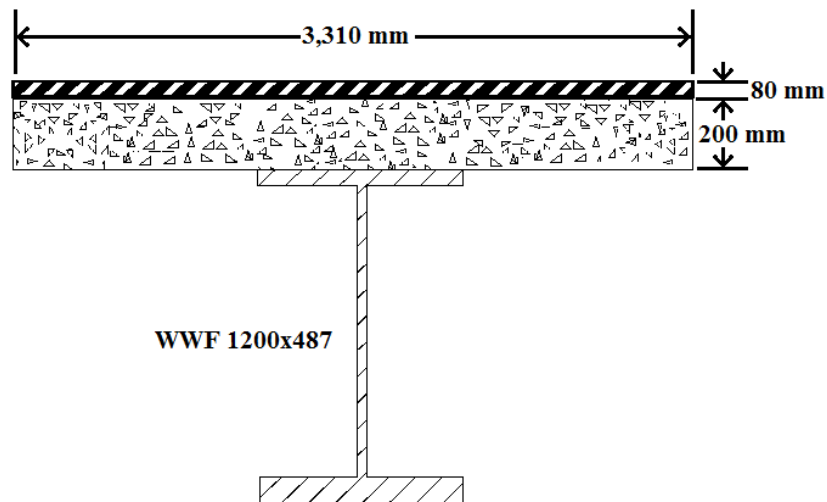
Cross section of interior girder, 35 m steel-composite (x4)
